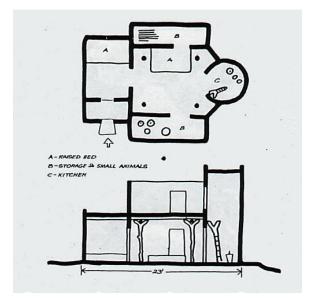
Typical Plan and Section of a Dogon Familial House (Merkus, n.d).
